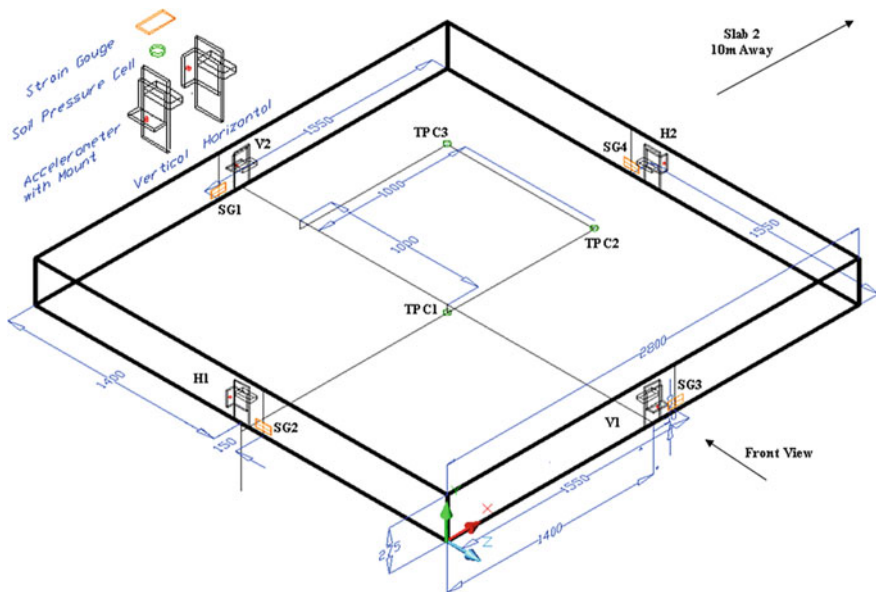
Instrumentation layout for Slab 1 (3D View)
